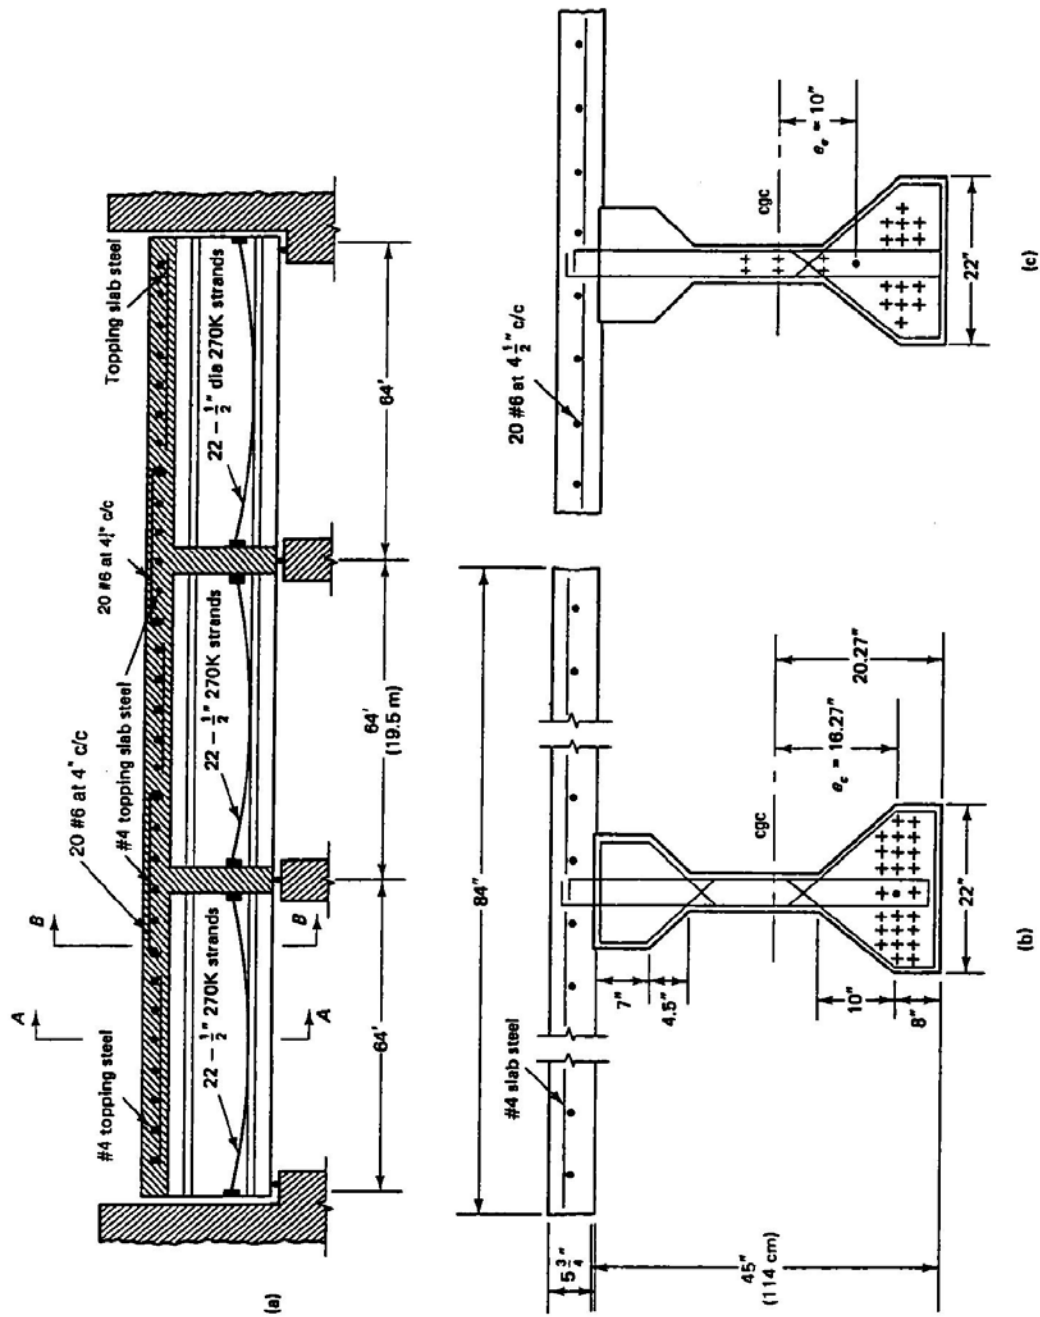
Schematic geometry details of continuous beam in Example 6.6 (see also Example 4.7). (a) Longitudinal section of bridge beam (not to scale). (b) Midspan section A-A. (c) Support section B-B.
